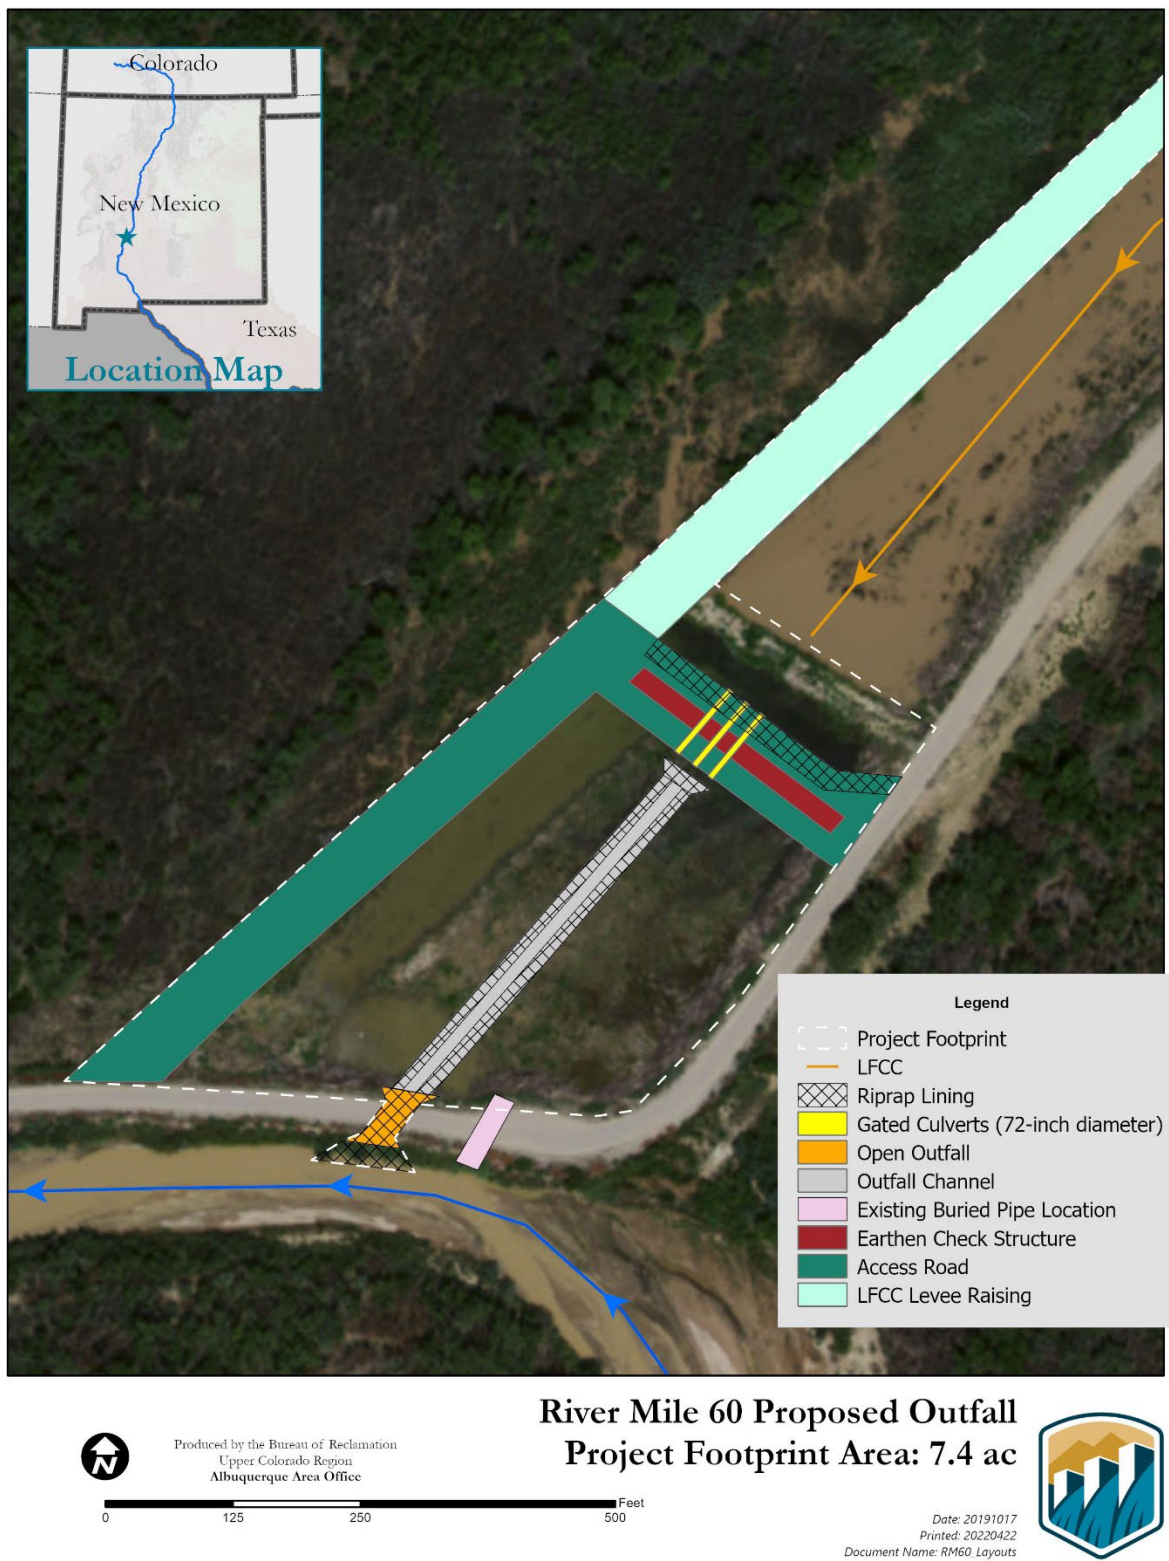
RM 60 Proposed outfall elements plan view. The LFCC is not being raised, only the levee.
